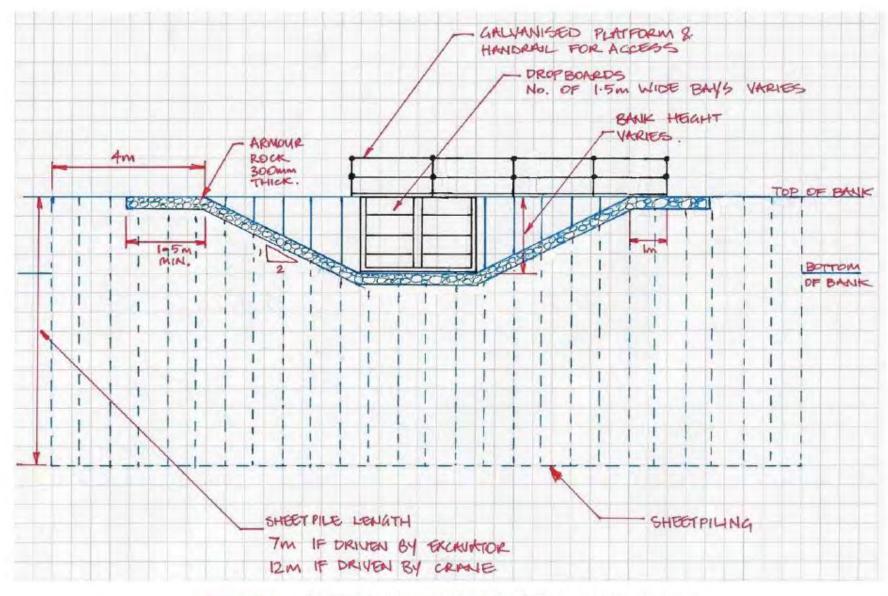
Elevation view. Assumed details for sheetpile regulator structures
